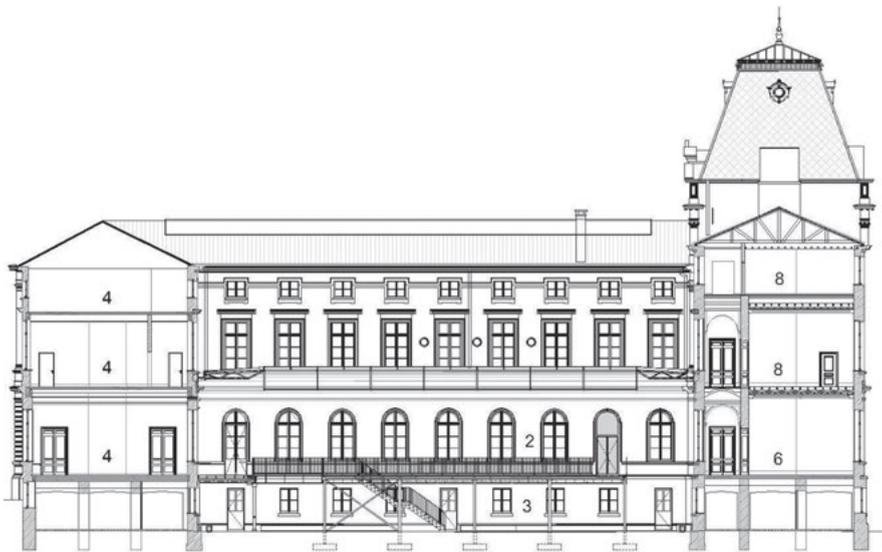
Section through the atrium with glass roof and floating platform containing the entrance and the reading room. © Architekturburo Ro Berteloot.
